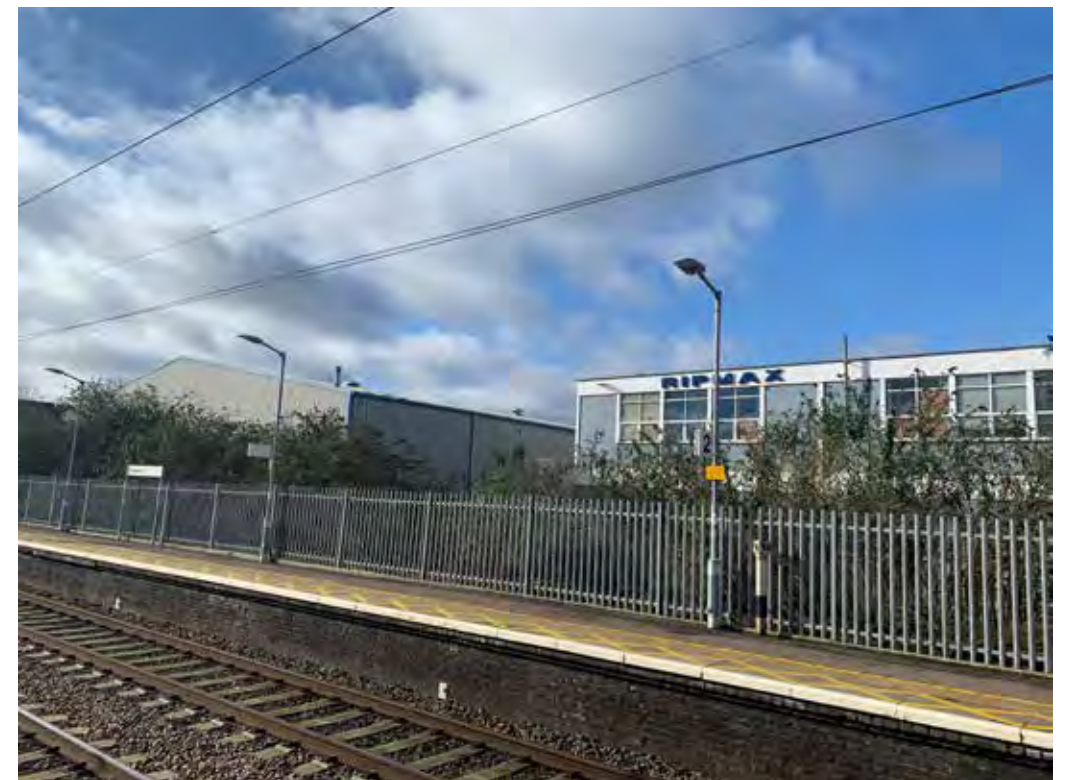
The existing buildings from Platform 1 at Brimsdown Station
